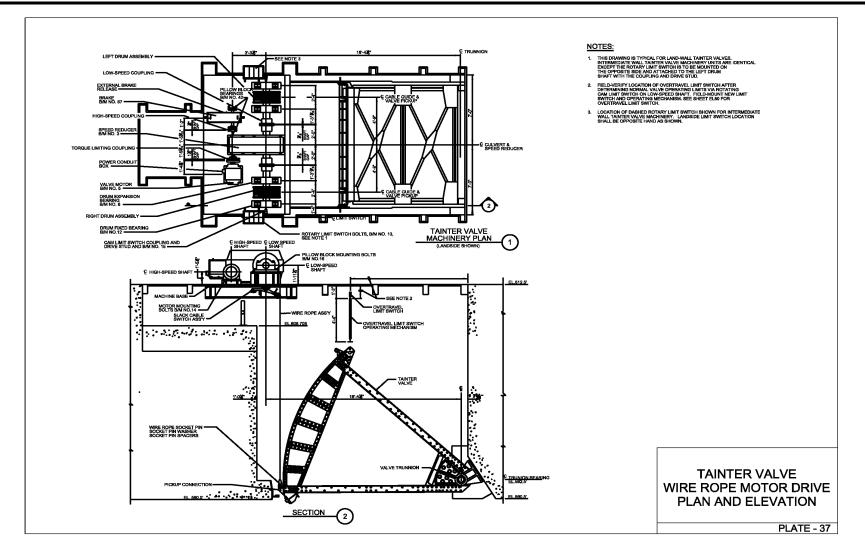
Plate 37: Tainter valve wire rope motor drive plan and elevation
